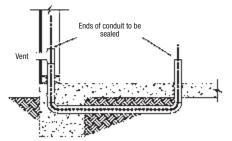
Installation in Nonmetallic Conduit with Venting
